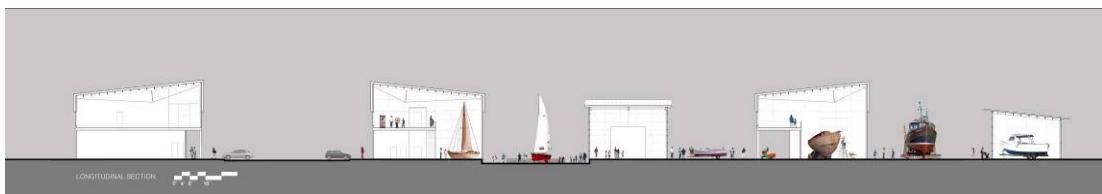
Longitudinal section through the site showing the activities that happen inside the building as well as in the exterior spaces.
